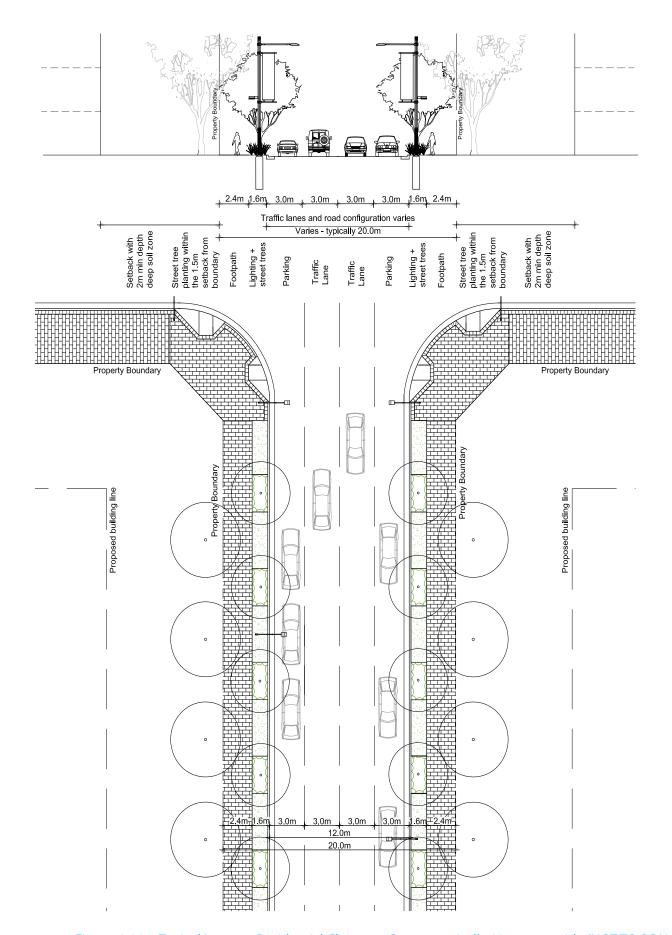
Typical Layout - Residential Character Street - typically 20 metres wide (NOT TO SCALE)
